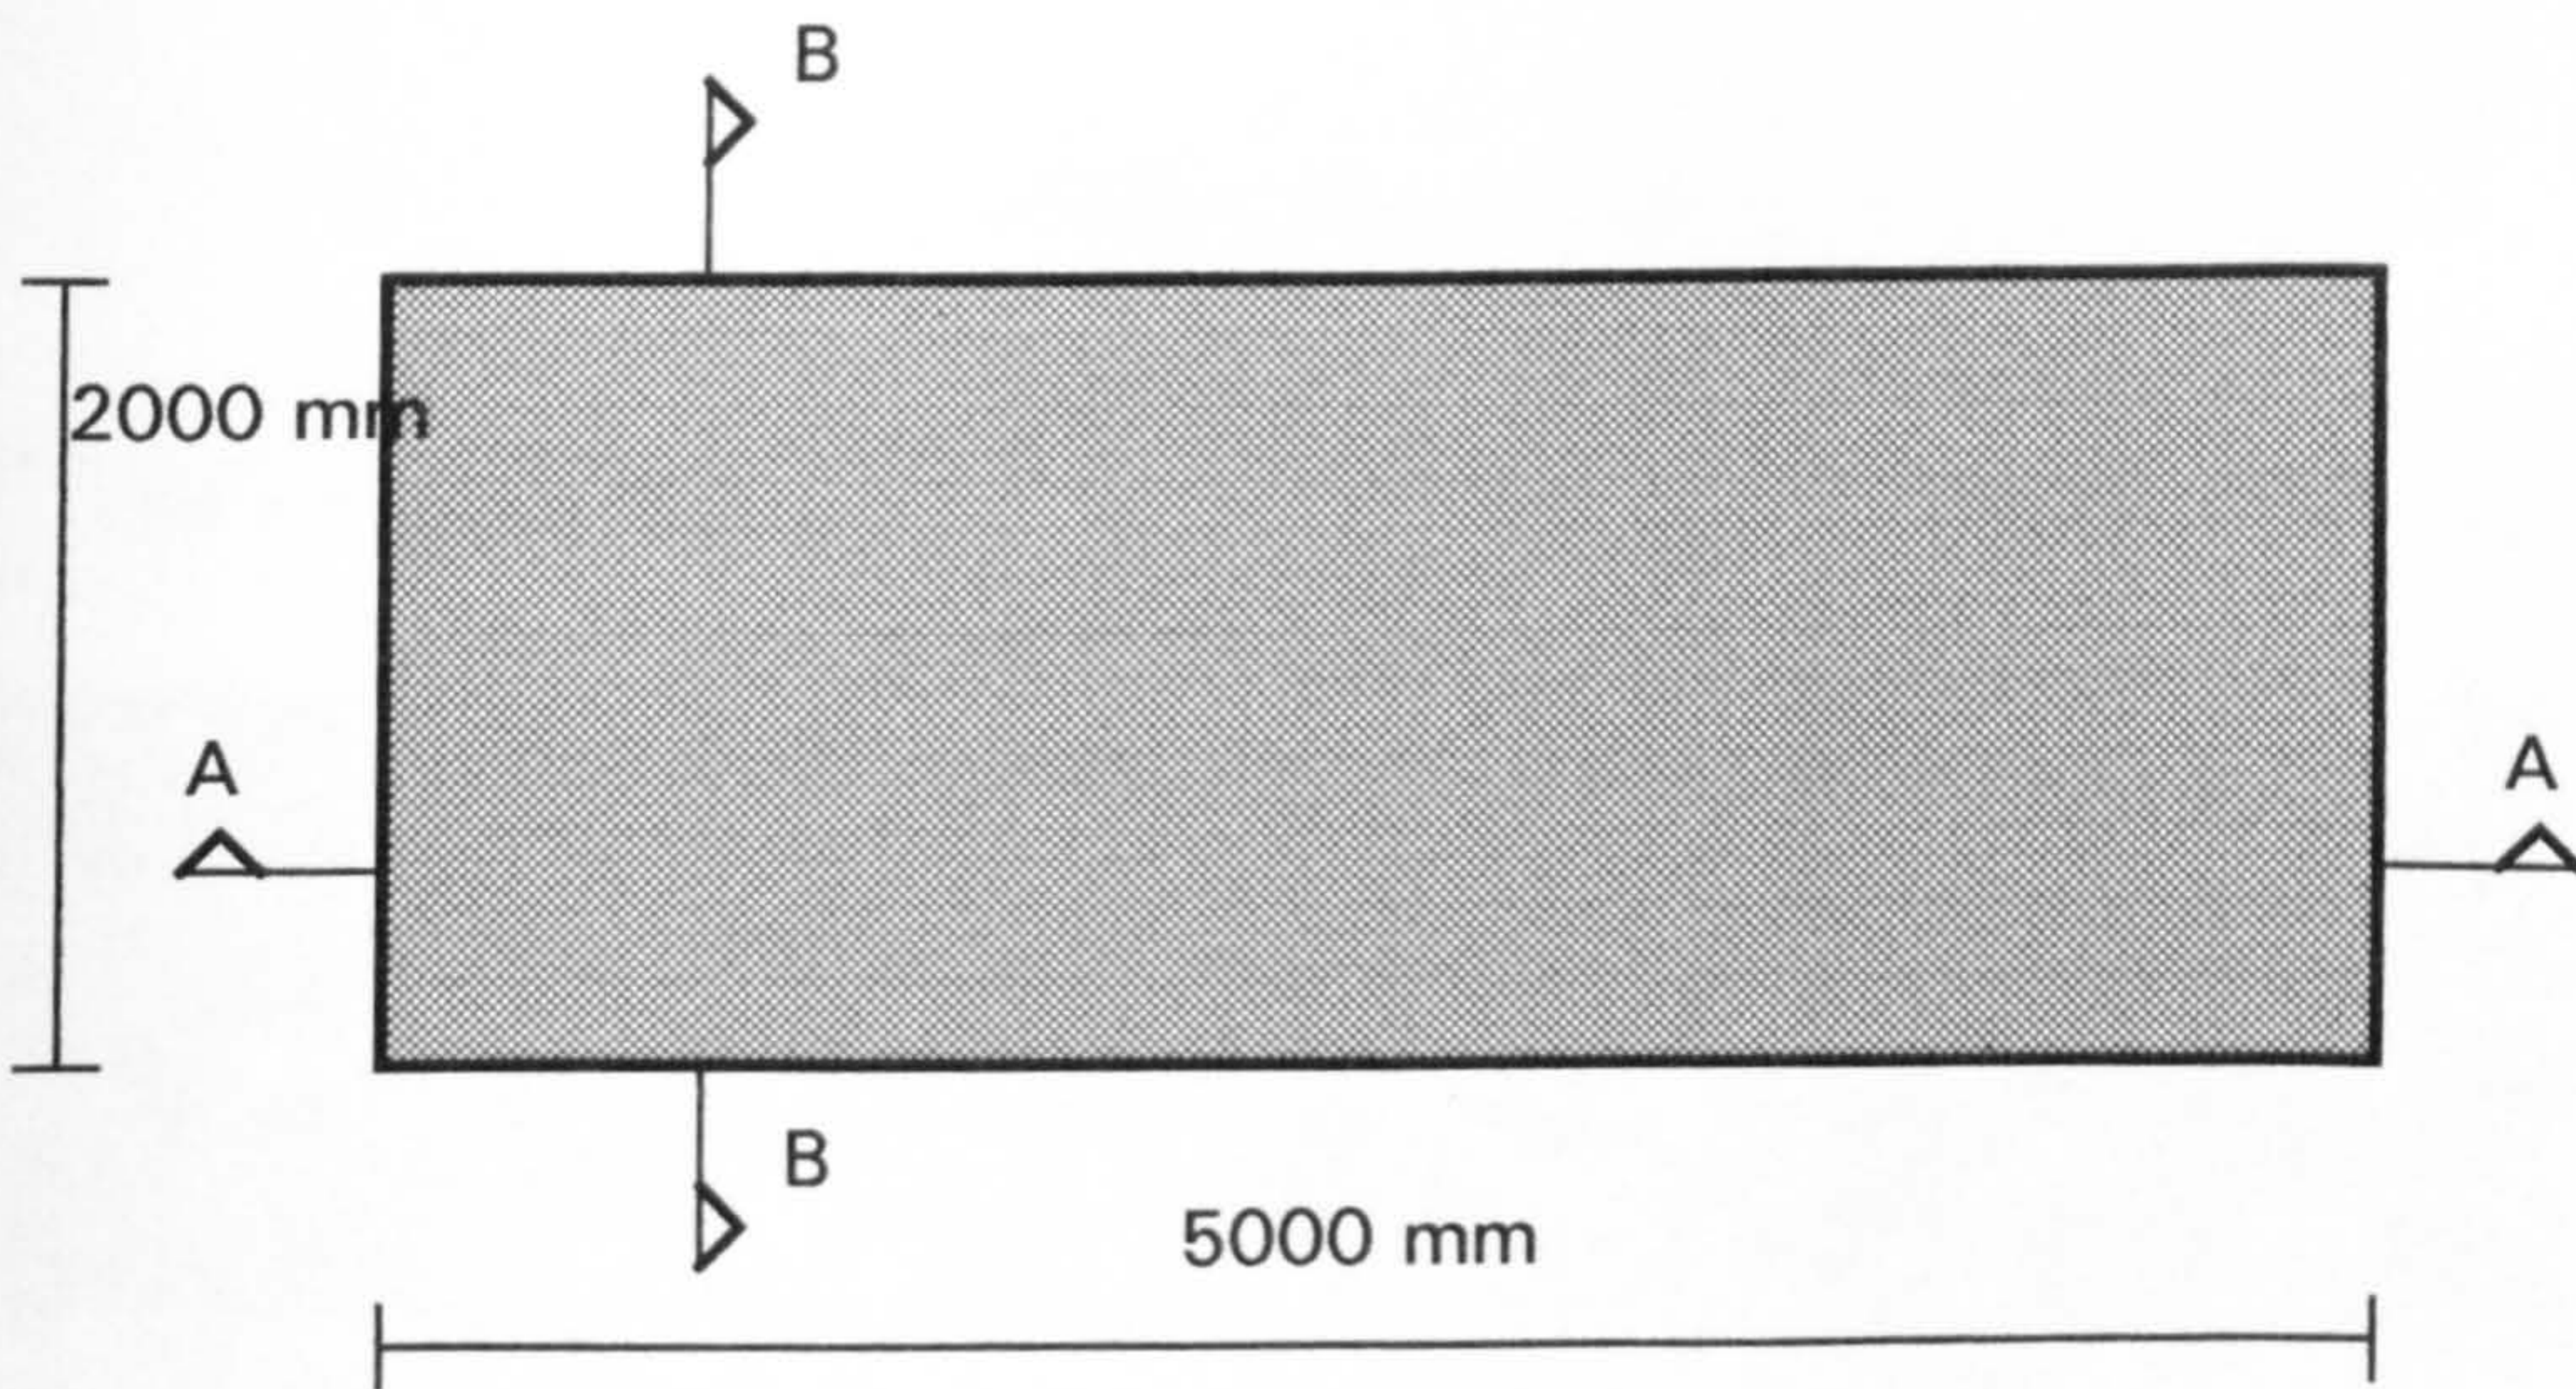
The new steel fibre reinforced concrete pavement plan
